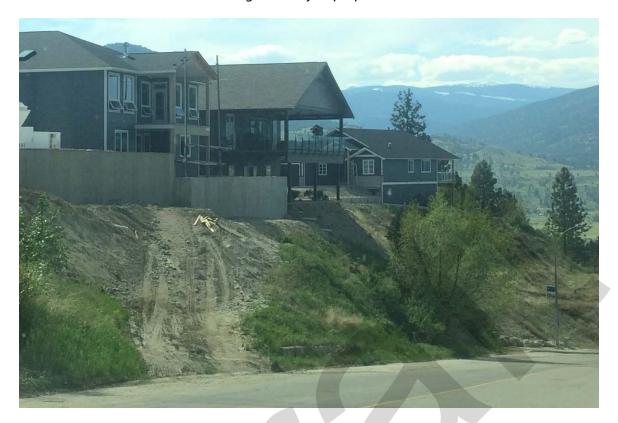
Area along Balsam Avenue where retaining walls are proposed
